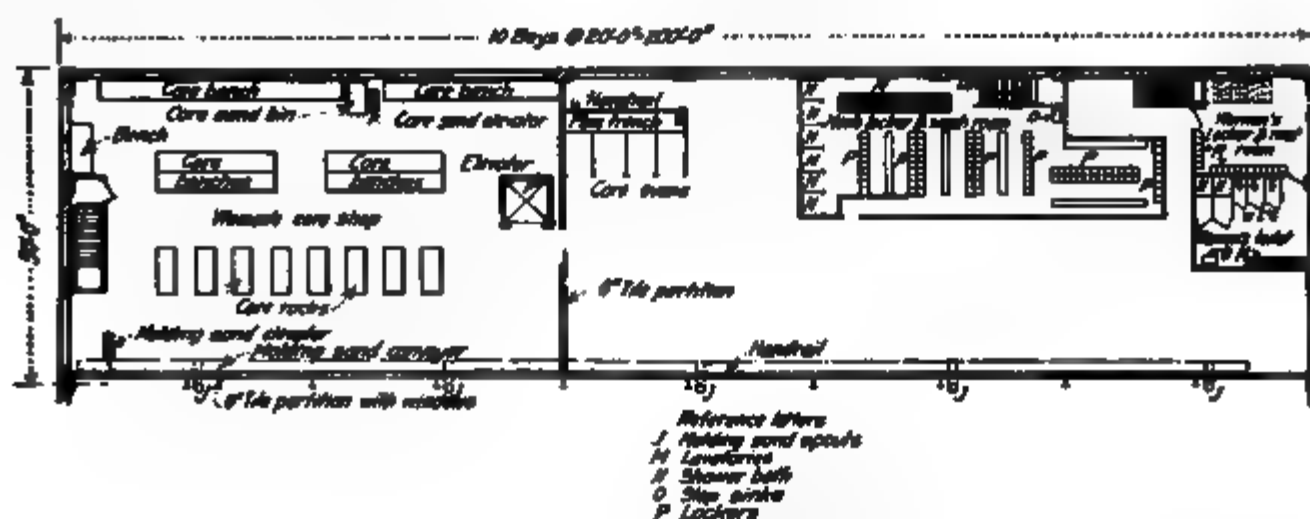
Plan of second floor, Blake-Knowles brass foundry, Cambridge, Mass.
